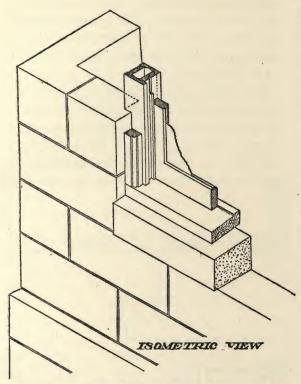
Method in detail of work of constructing window ledge and frame in connection with blocks.
